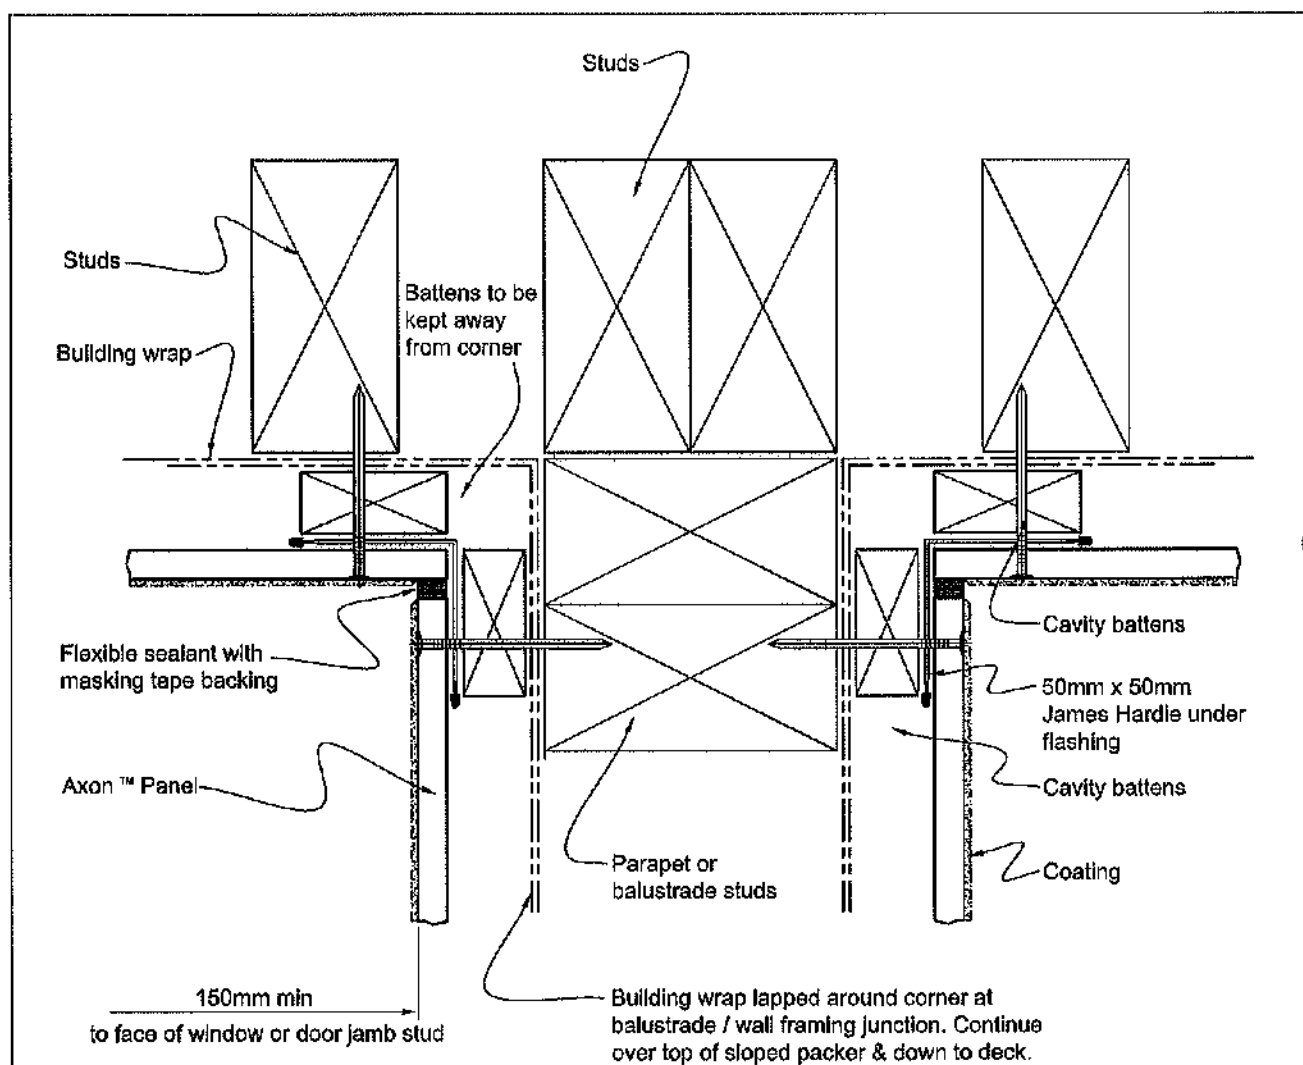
ENCLOSED DECK BALUSTRADE TO WALL JUNCTION
